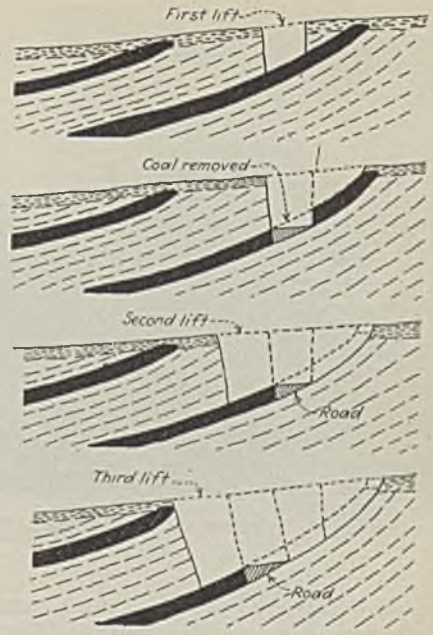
Diagrammatic Plan of Typical Outcrop Stripping
